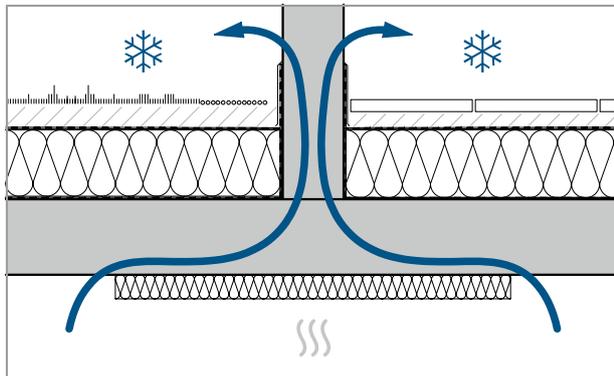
Pos. ③: Heat flow in roof construction with flank insulation
